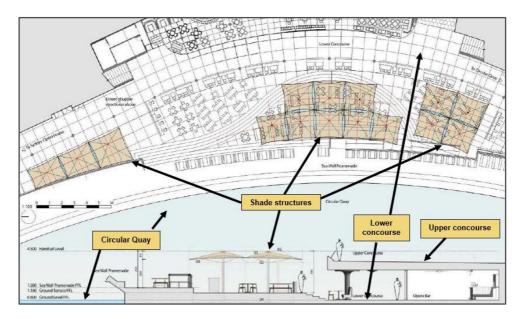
| Proposed shade structures (Source: Applicant's Architectural Design Statement)
